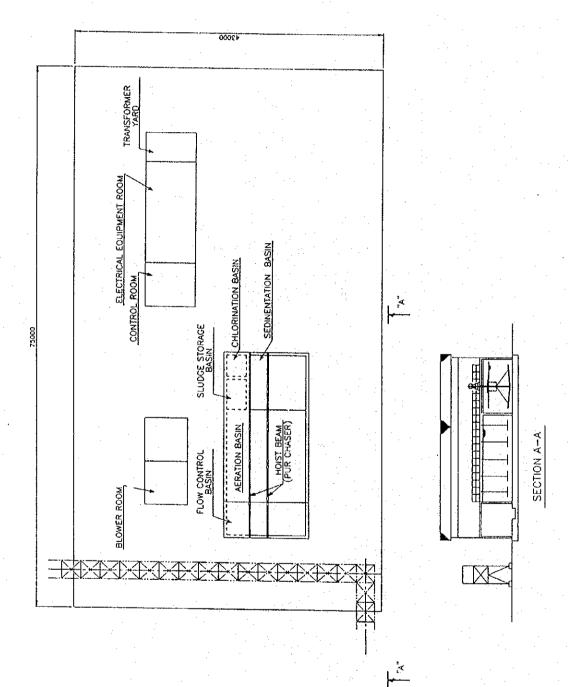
Layout of Live Sewerage Treatment Station
